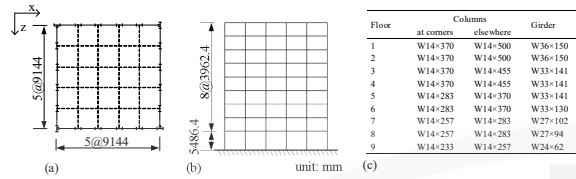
(a) Typical floor plan, (b) elevation, and (c) member sizes of the nine-story building.
